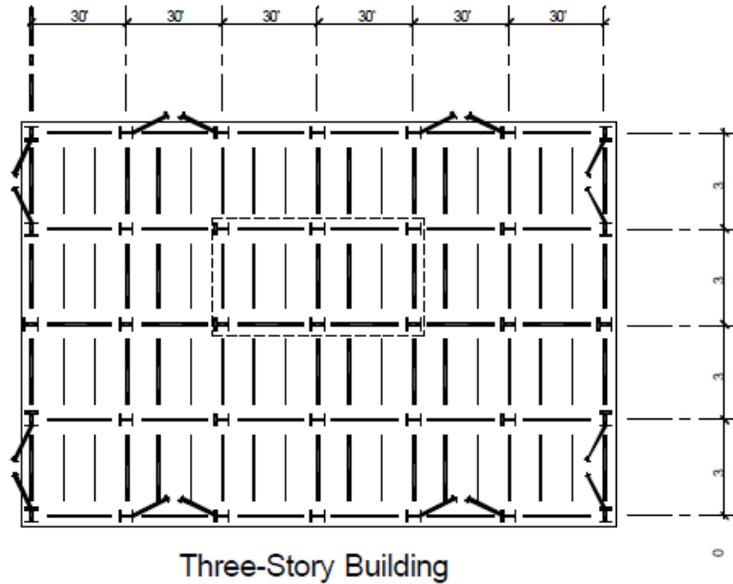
Plan View of the Three-Story BRB Braced Frame Structure (Sabelli, 2001)
